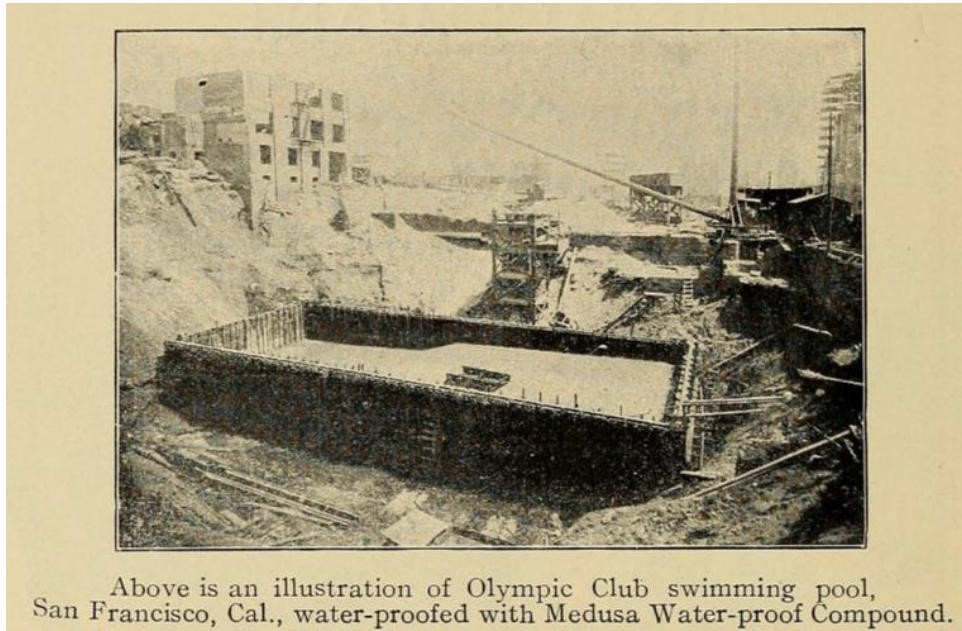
Photograph of a construction site in San Francisco, showing a swimming pool being built within the foundation of a future building. The image was advertising the new Medusa brand as a more waterproof cement.
